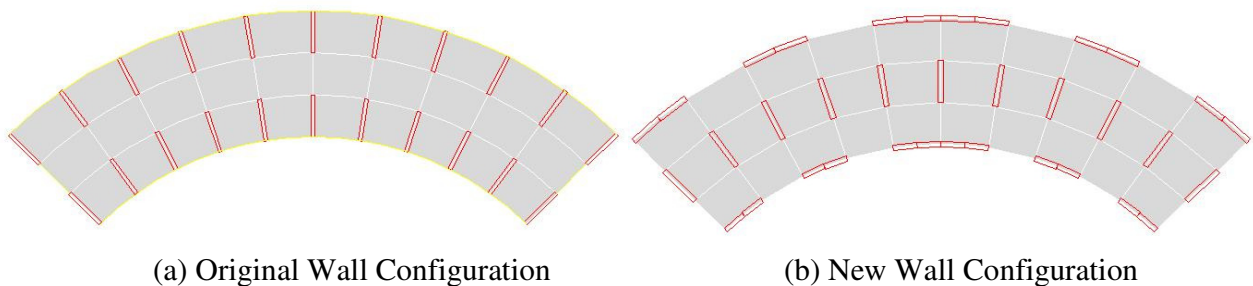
Curvilinear Shape, (SW) System Layout Plans
